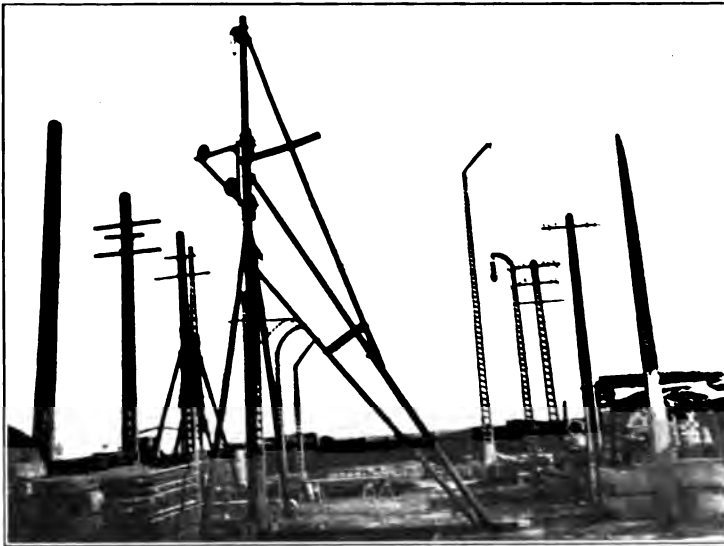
TYPES OF REINFORCED CONCRETE POLES AT PLANT OF R. WOLLE, LEIPSI^C, GERMANY.
